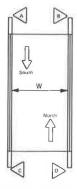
Barrier requirements for bridge parapets and bridge rail ends.
